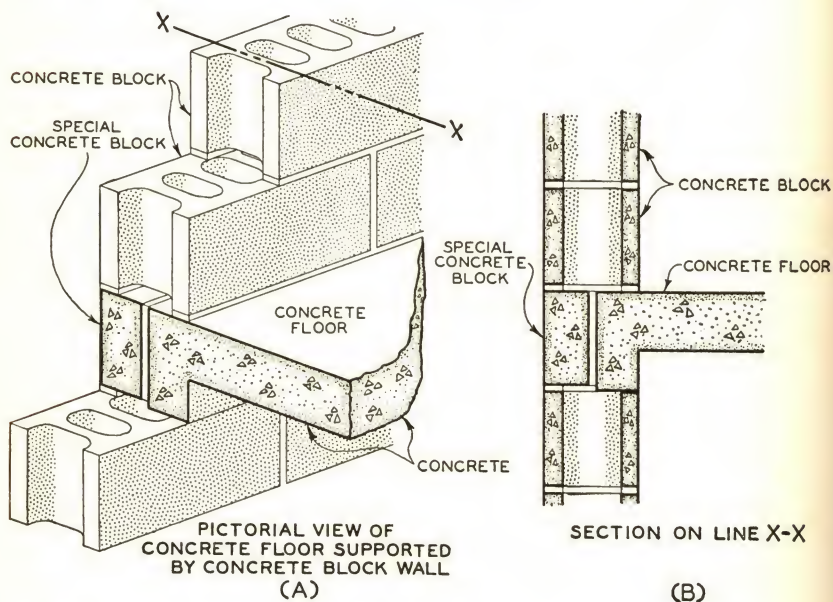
Pictorial and Section View of a Concrete Floor Supported by a Concrete Block Wall. Note the special concrete block used at the floor level to preserve the bond and exterior appearance
